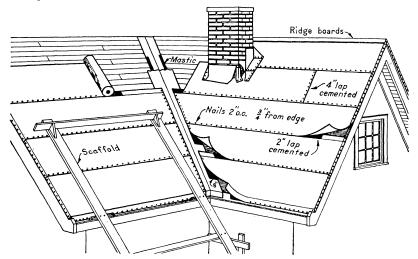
Roll roofing laid parallel to the eaves; note the scaffold.
